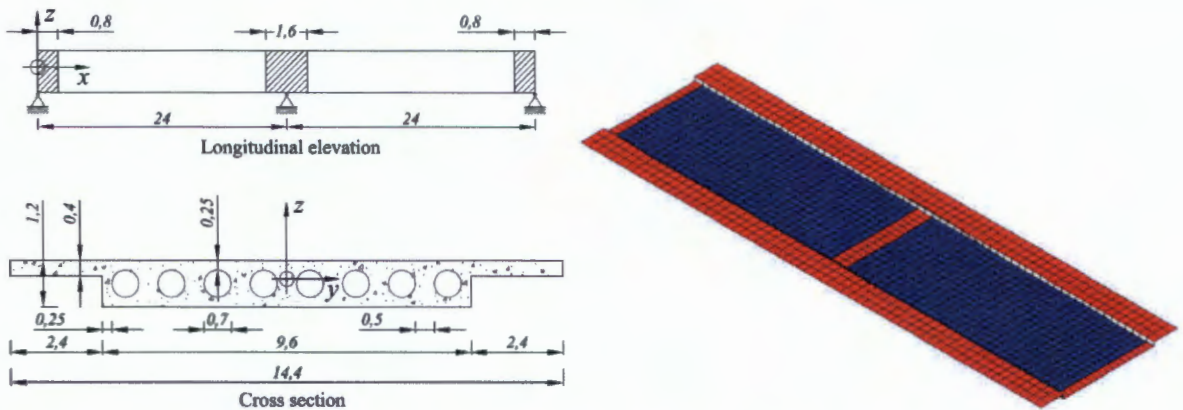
Longitudinal elevation, cross-section, and finite element model of the voided slab bridge deck (Diaz *et al.*, 2010).
